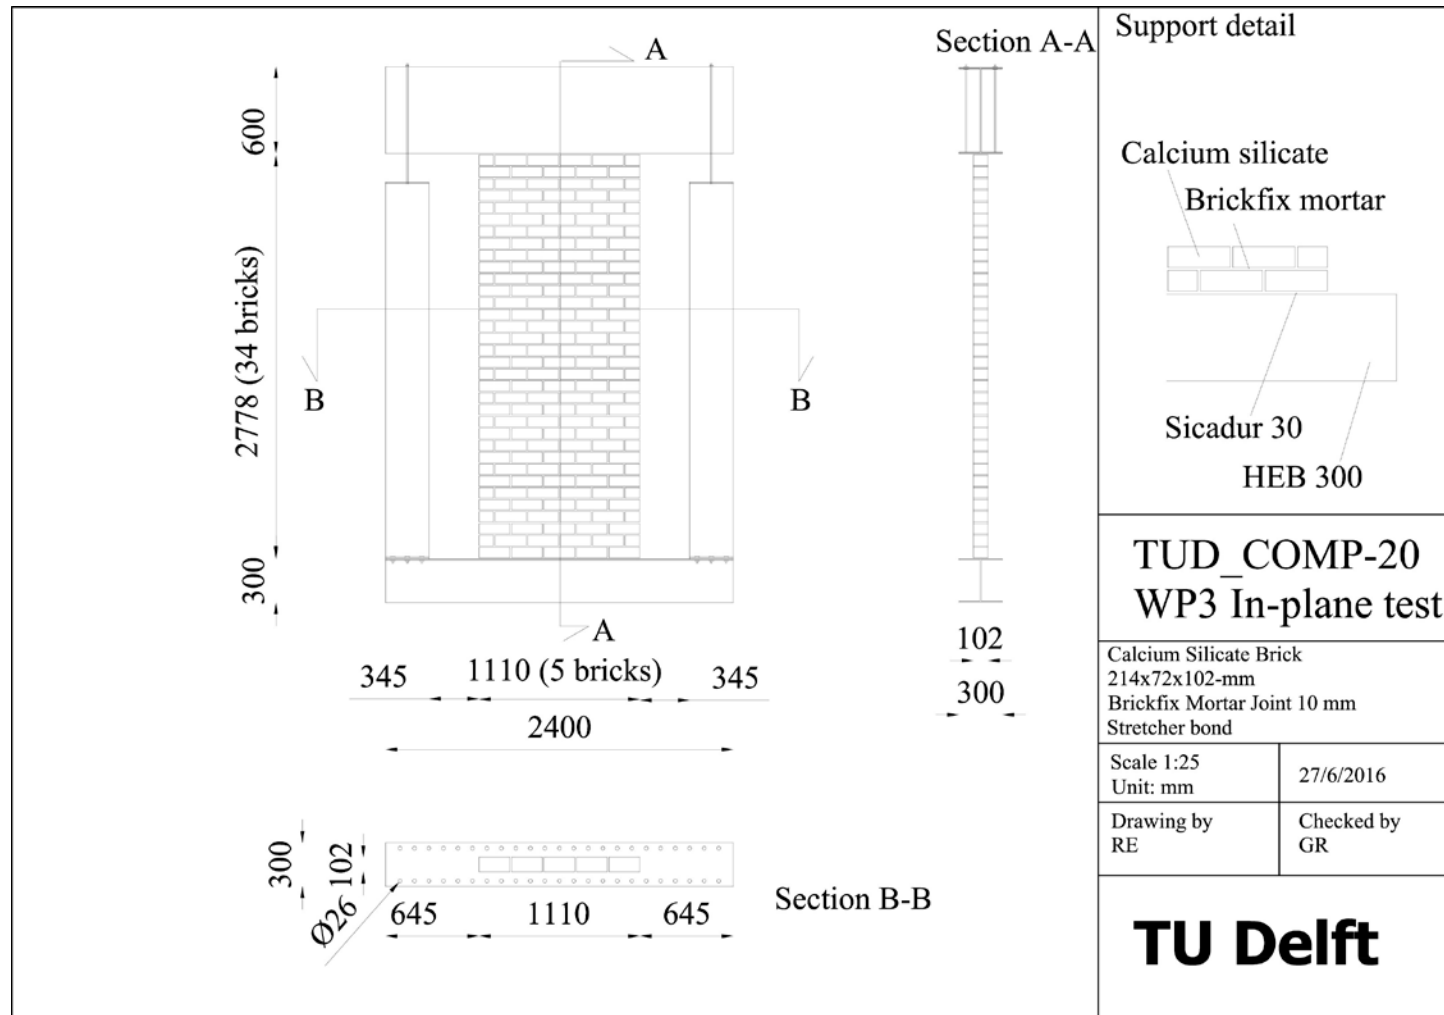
Drawing adopted for the construction of wall TUD_COMP-20. As built dimension in Table 19.
